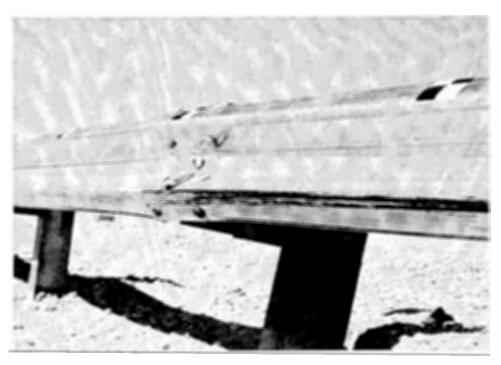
Long-Span Guardrail System Rail Damage, Test OLS-3 (Design No. 3)
